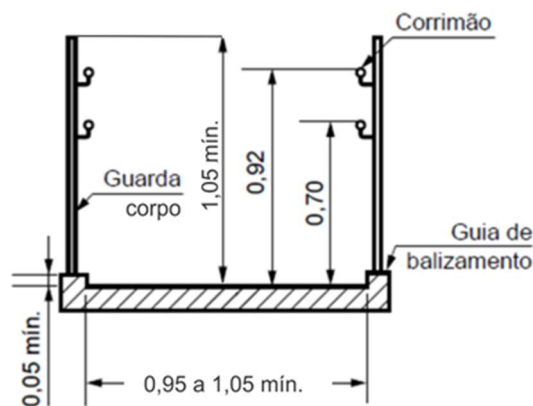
GUARDRAIL (GUARDA-CORPO), HANDRAIL (CORRIMÃO) AND BEACON GUIDE (GUIA DE BALIZAMENTO).
